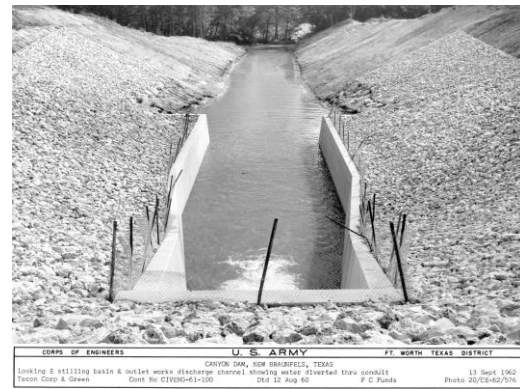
Water Diverted through Conduit, 12 August 1960
